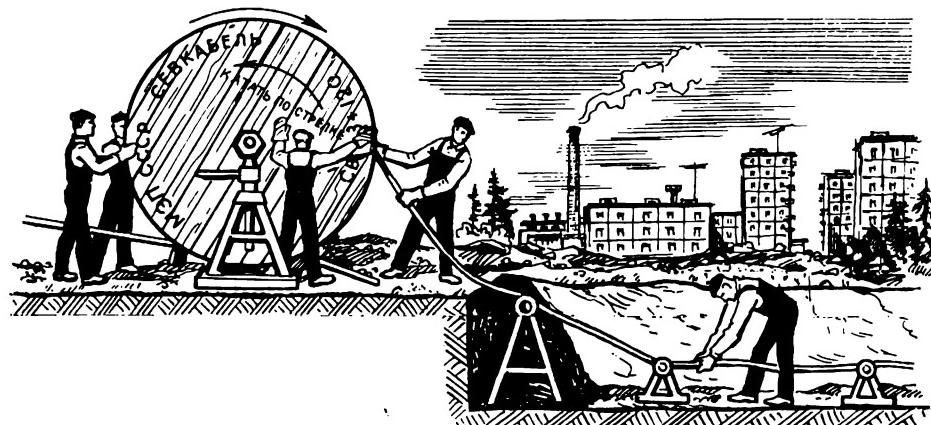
Cable reeling off a jack-mounted drum by means of a winch
